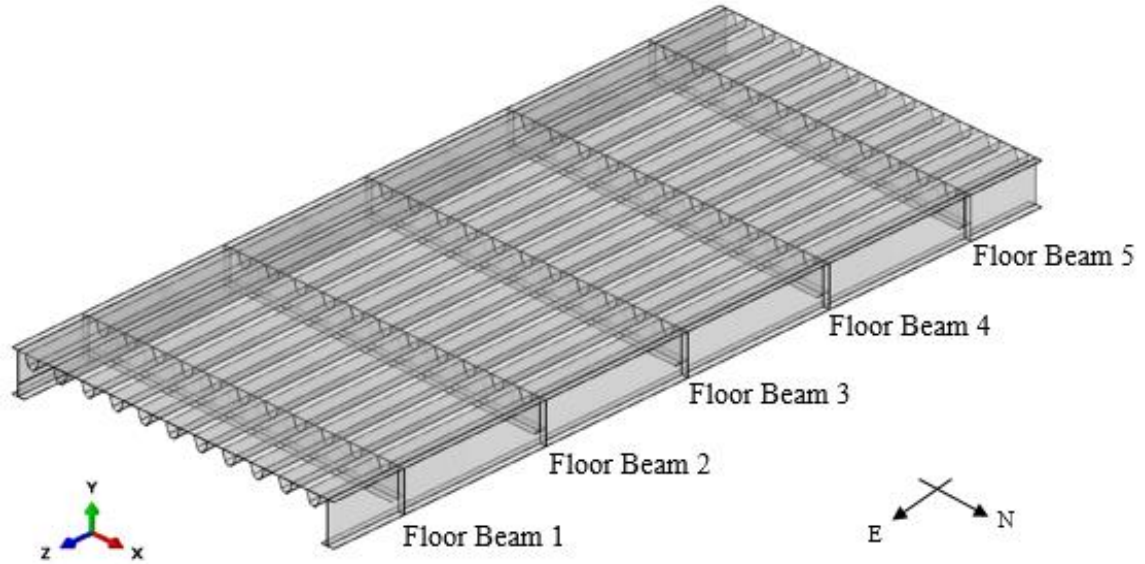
Illustration. Naming convention for the plate girder model floor beams with Floor Beam 1 on the east side of the deck.
